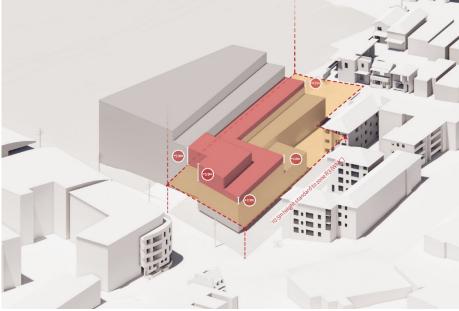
Plan of School gym, indoor sporting facility or hall building that could be developed as complying development (Source: AJ+C)
